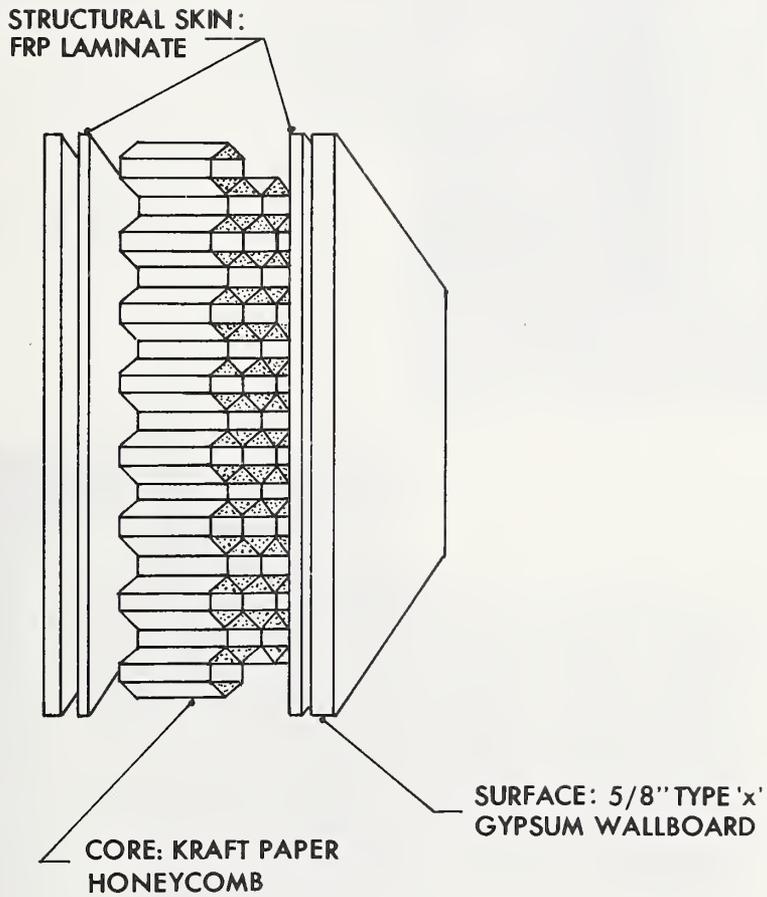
Construction of paper honeycomb sandwich test panel (GPHC).
